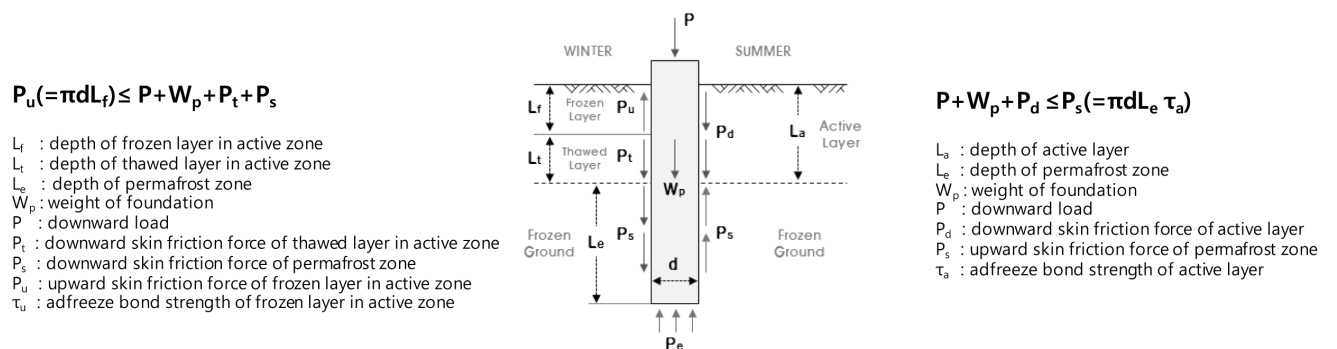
Loading conditions of pile foundation in frozen ground(Phukan, 1985)
